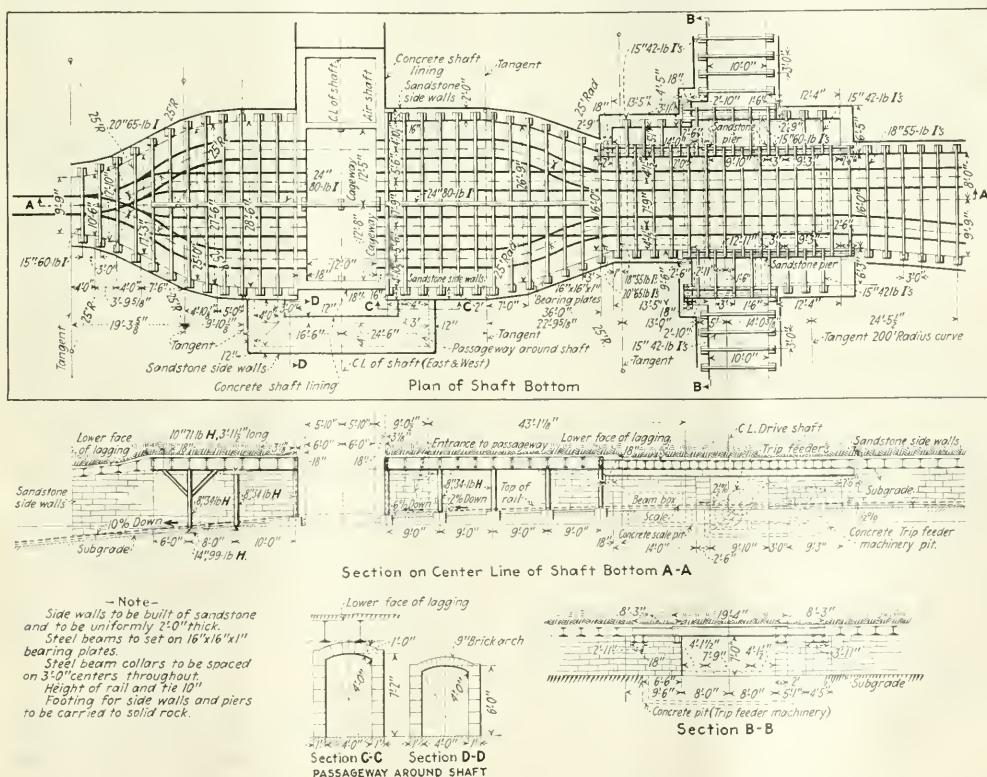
PLAN AND ELEVATIONS OF THE REVLOC SHAFT BOTTOM
